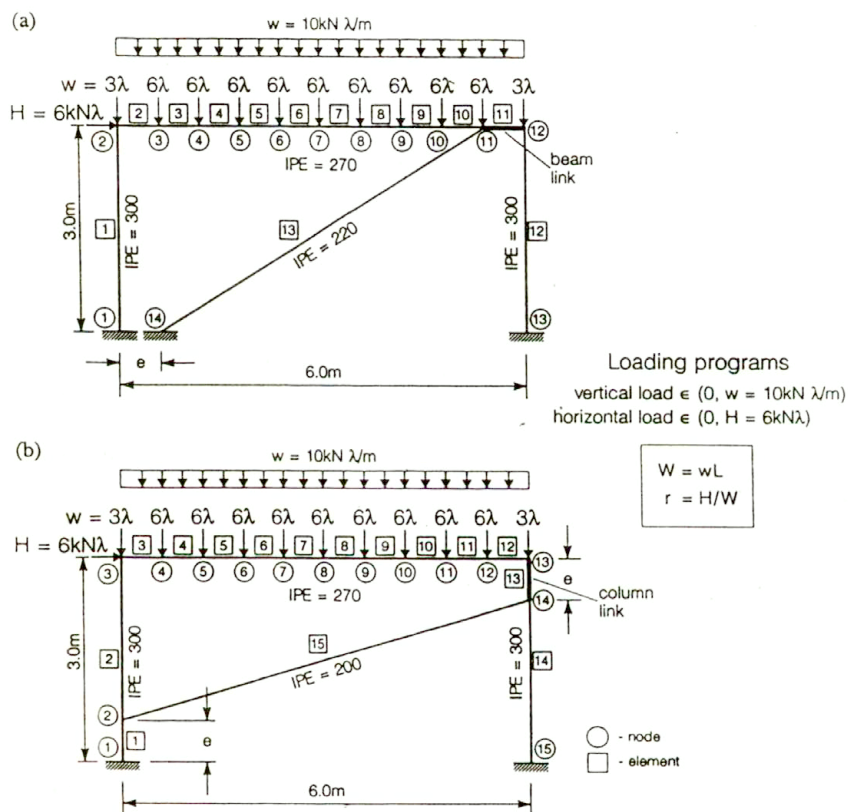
Eccentrically braced frames: a) Beam link, b) Column-link
